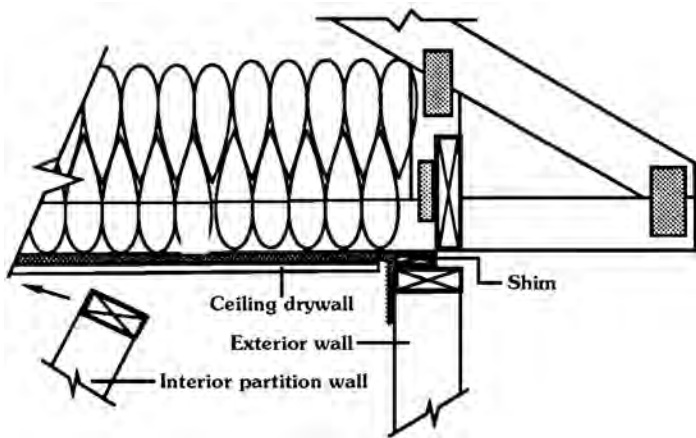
Using shorter stud length to fit under ceiling drywall
